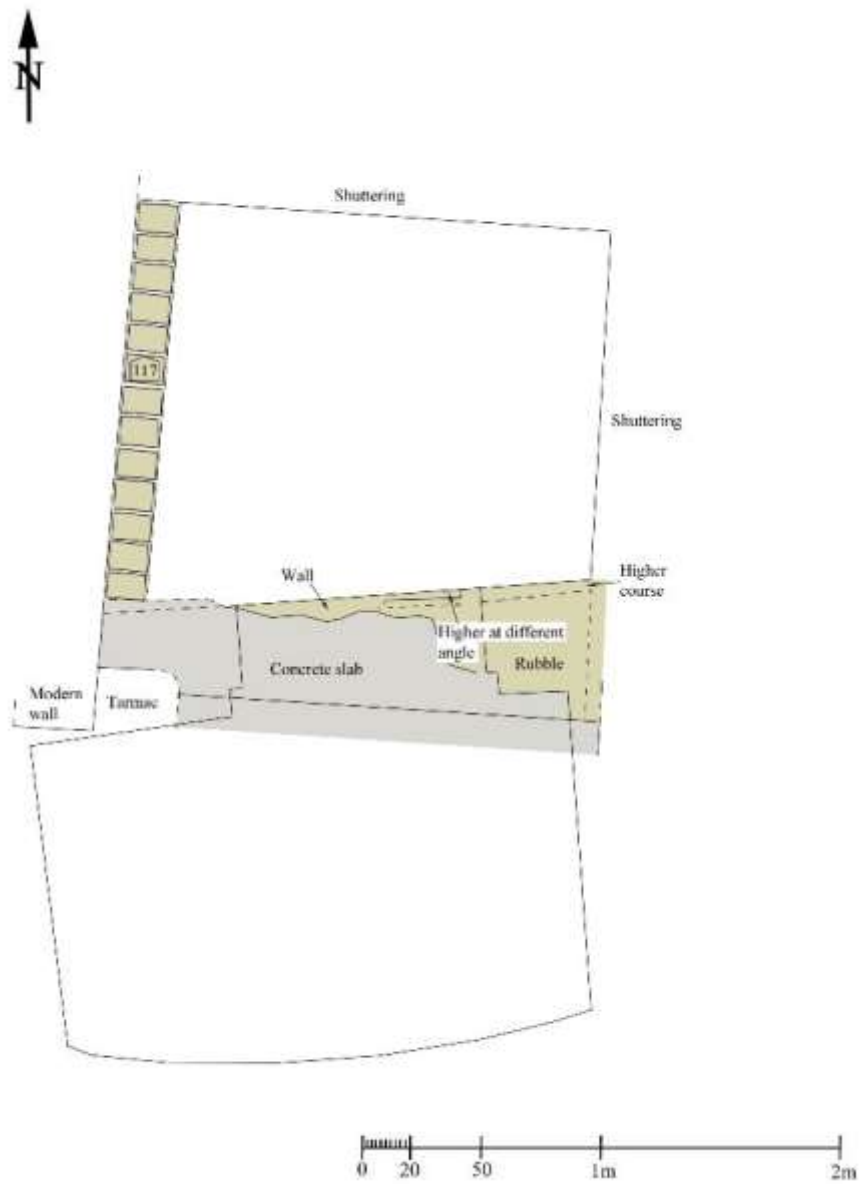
Plan of dropshaft 15. Original drawn at 1:20.
